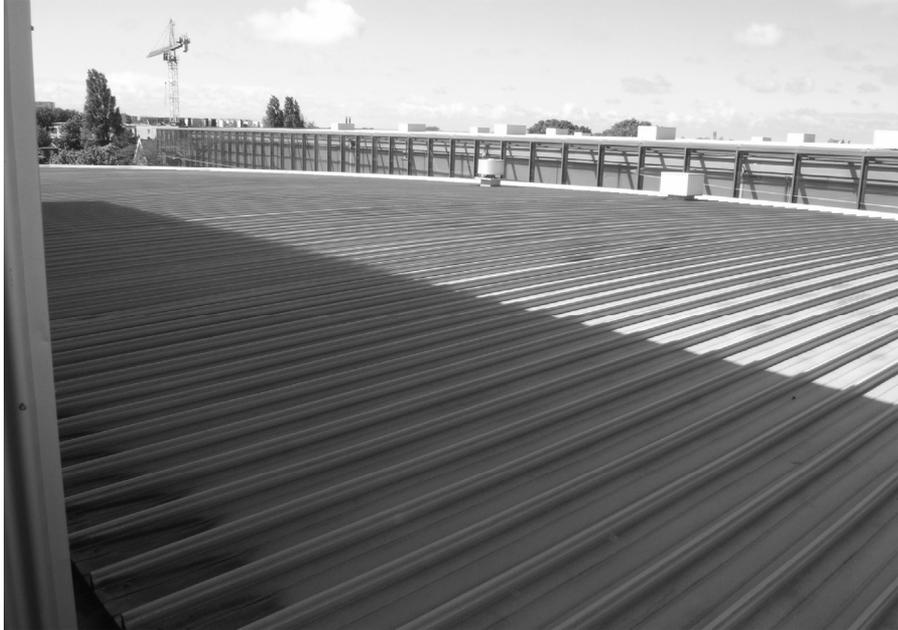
An example of light-weight flat roof where already the detailing only (elevated trough roof sheeting under sufficient slope in combination with lower positioned roof gutters) prevents any form of rainwater ponding that could impair the structural safety and quality of the roof
